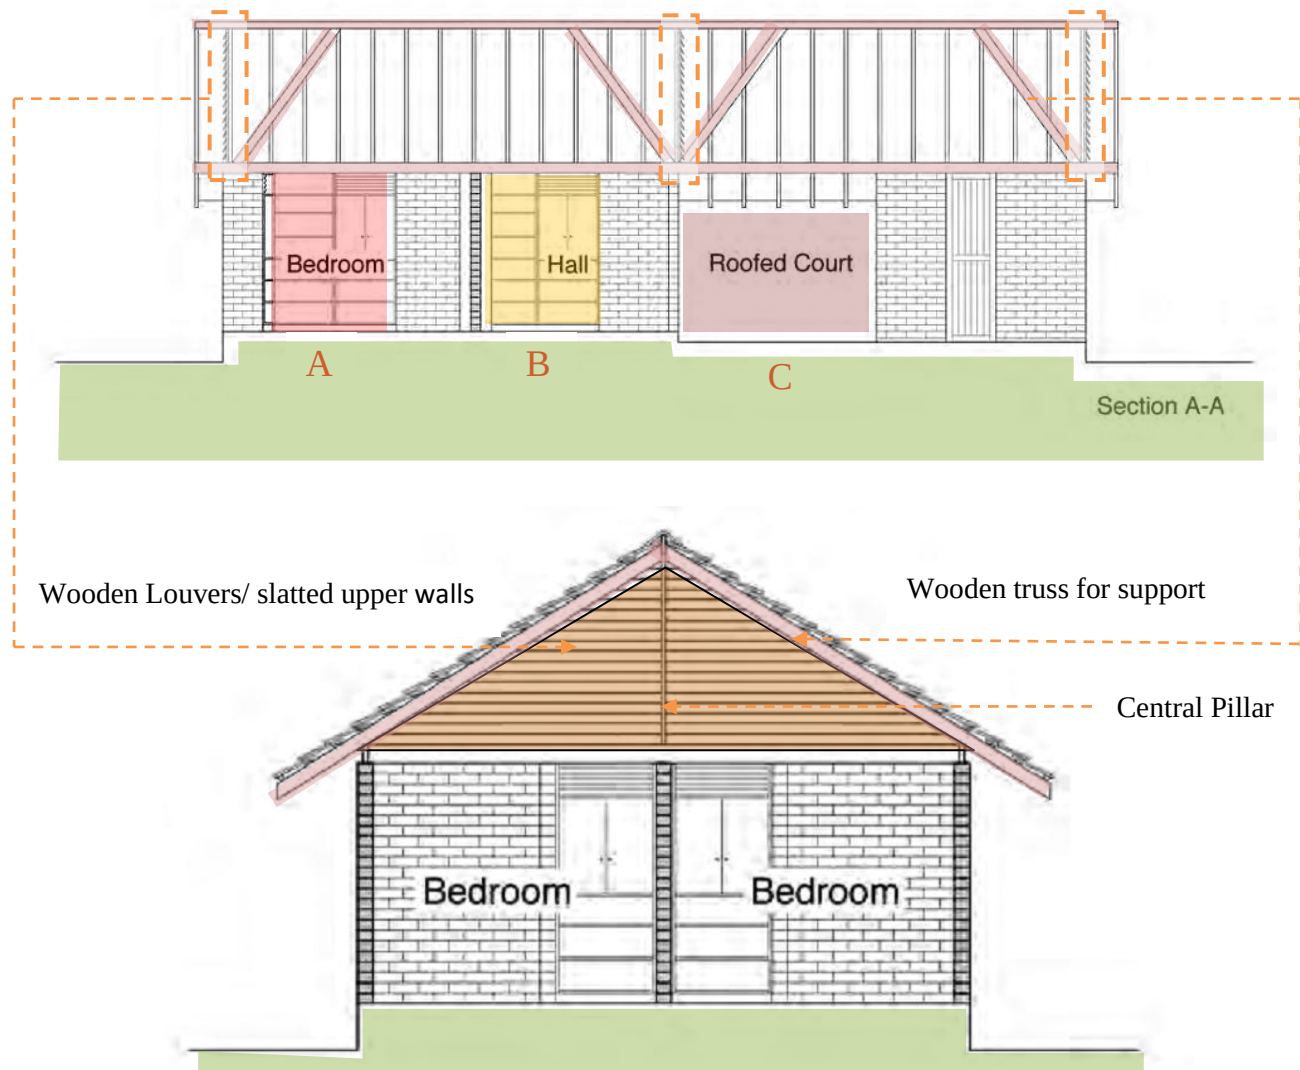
Longitudinal Section & Front Elevation showing the details of the housing units (Source: Sultan Barakat report, 2013; Rendering: Author)
